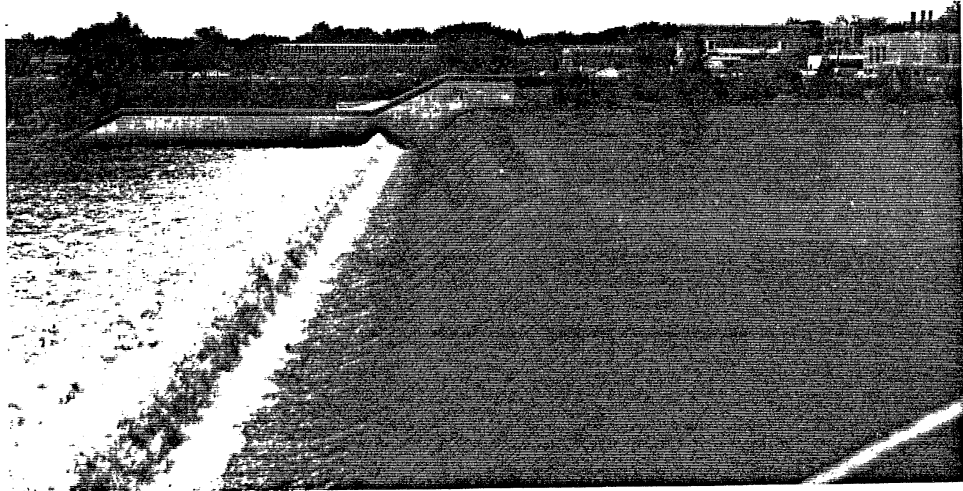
View from the left bank showing the main spillway and the location of the proposed powerhouse on the right bank.
